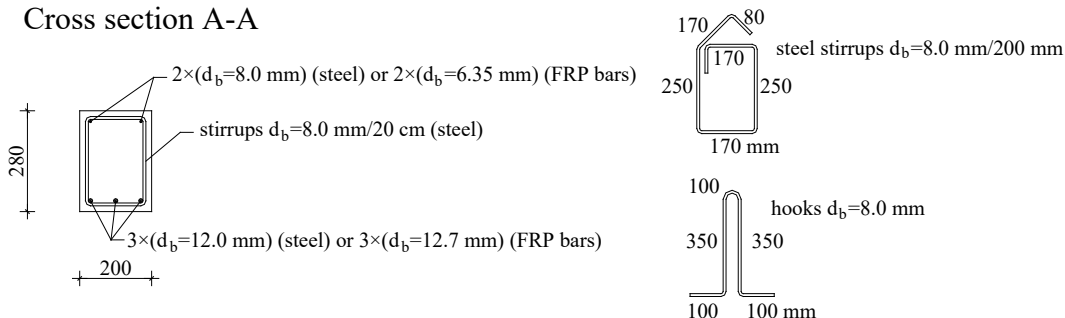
Dimensions and reinforcement of concrete beam specimen [6]
